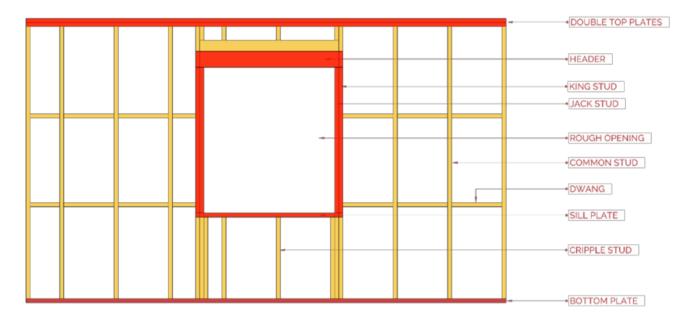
Timber to count with a 240mm tall timber lintel. This additional timber beyond 140mm needs to be added to the wall timber fraction.
